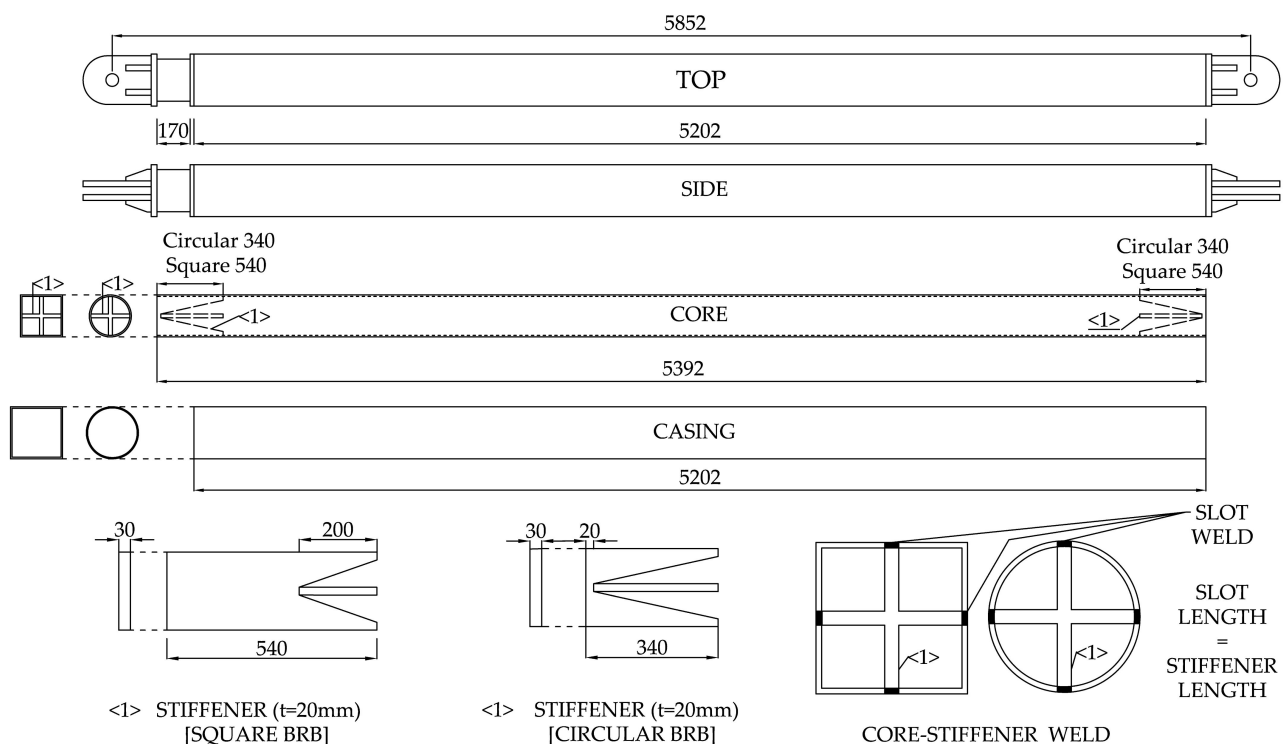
Details of the proposed BRB. (All dimensions are in mm).
